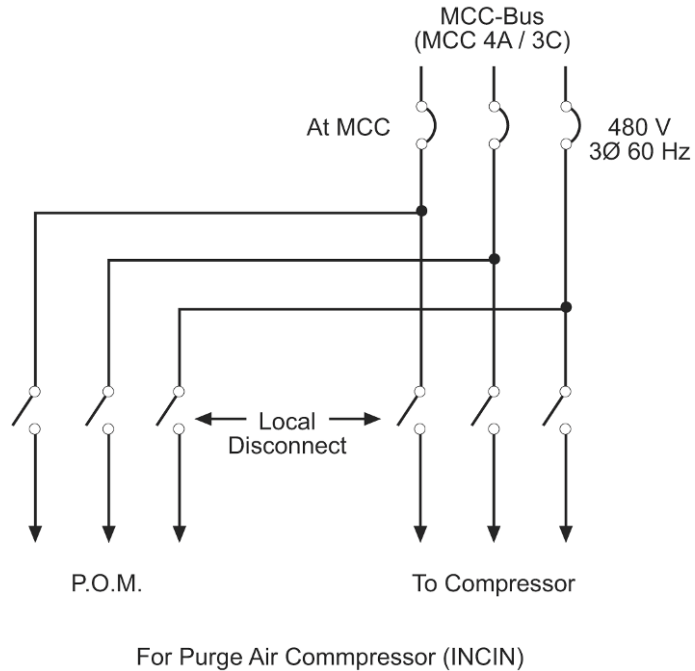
56 kW (75-hp) Compressor Motor Wiring Diagram
